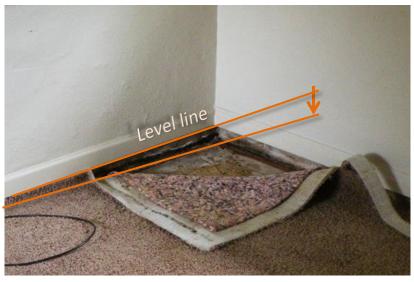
The interior floor slab is not supporting the exterior load-bearing walls, as seen here where the floor slab has settled independent of the walls.
